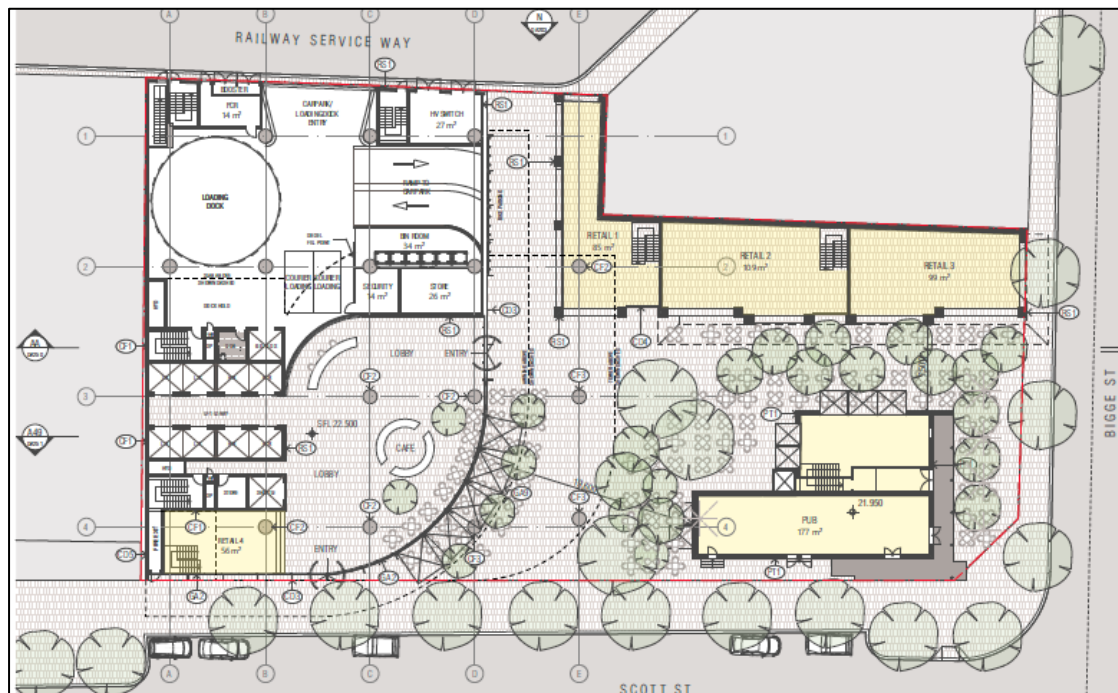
Proposed Ground Floor Plan (FK Architects, 2018)
